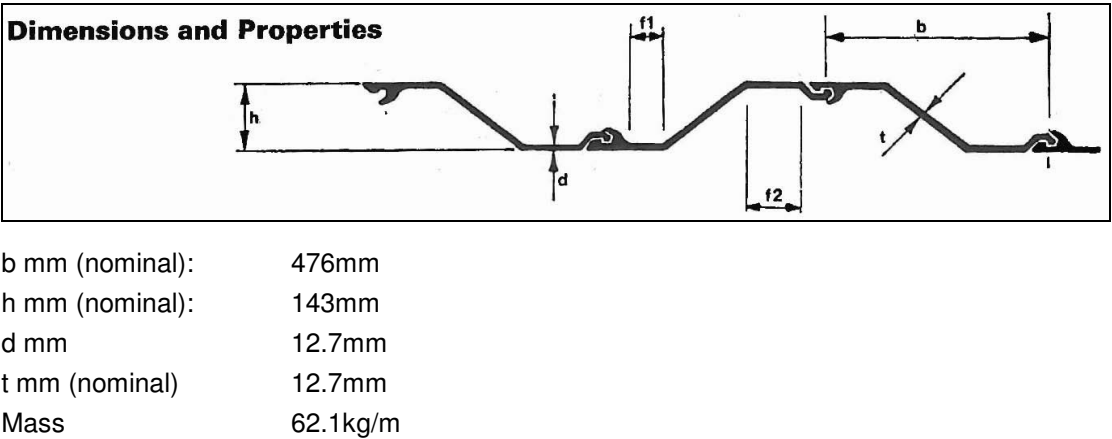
Main Pier Sheet Pile Wall – Pile size diagram
